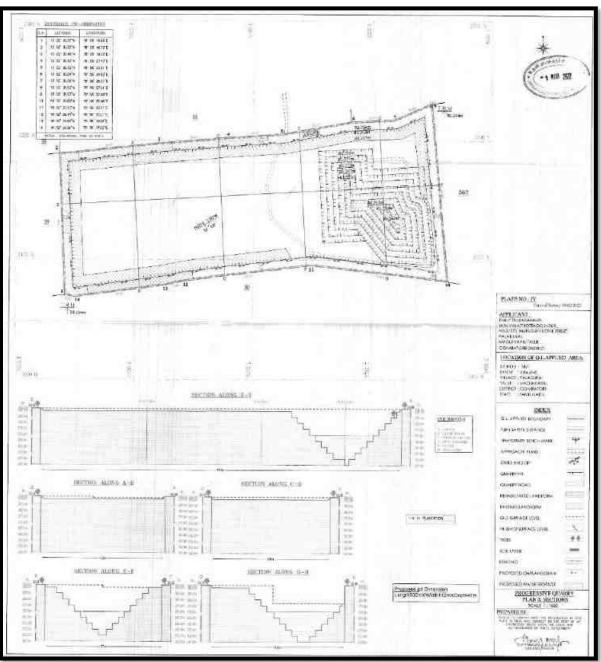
CLOSURE PLAN AND SECTIONS – P1
